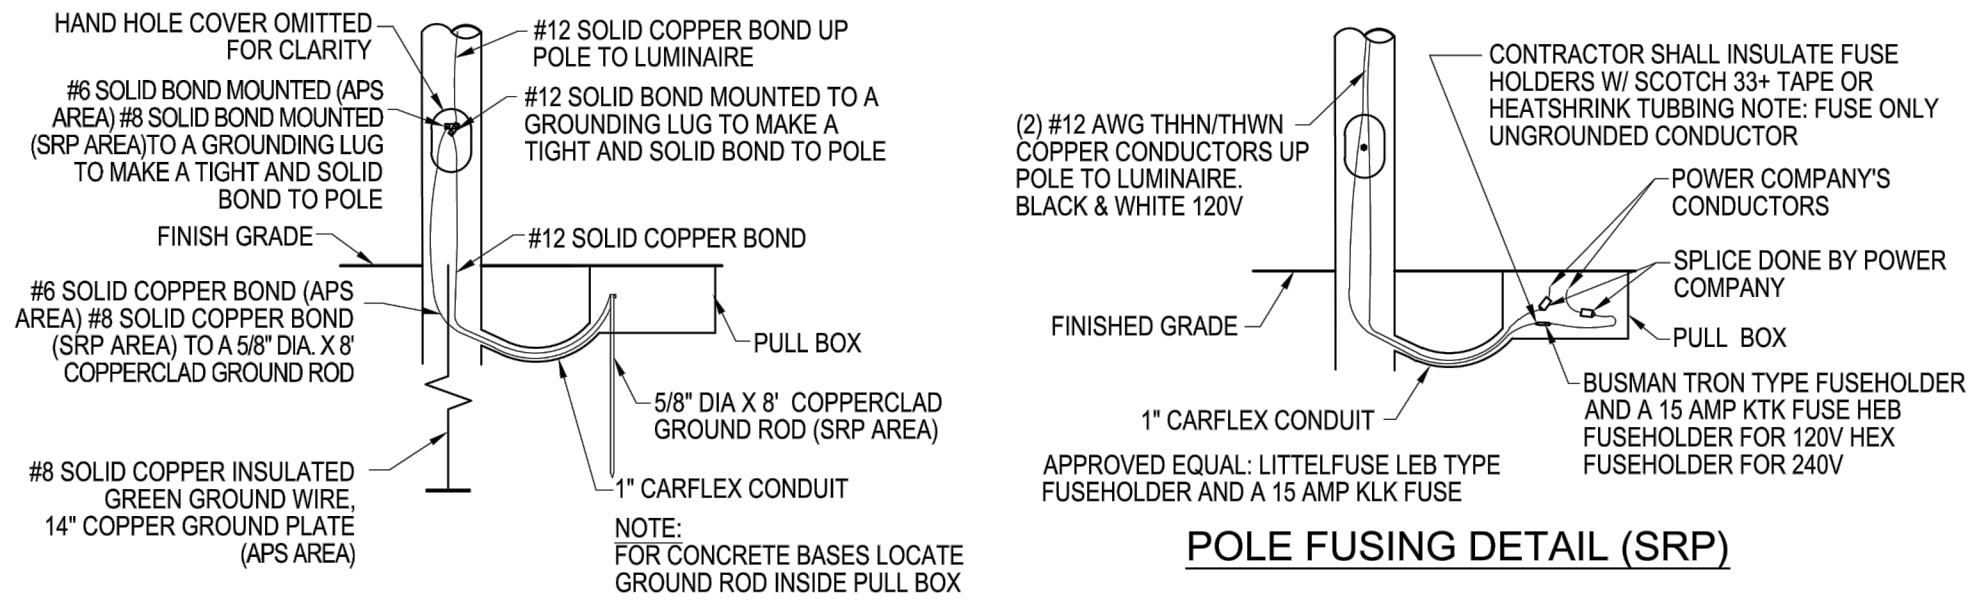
Avondale STANDARD DETAIL	ARCHITECTURAL STYLE STREET LIGHT POLE	APPROVED BY: <i>[Signature]</i> DATE: 8 24 16
